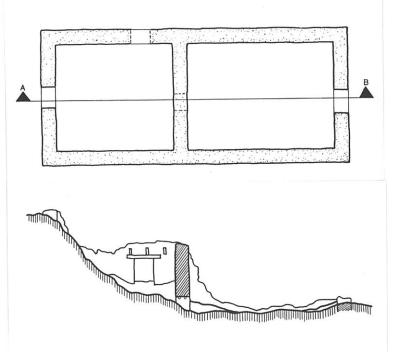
Plan views and sections of structures at Red Canyon Stage Stop.
